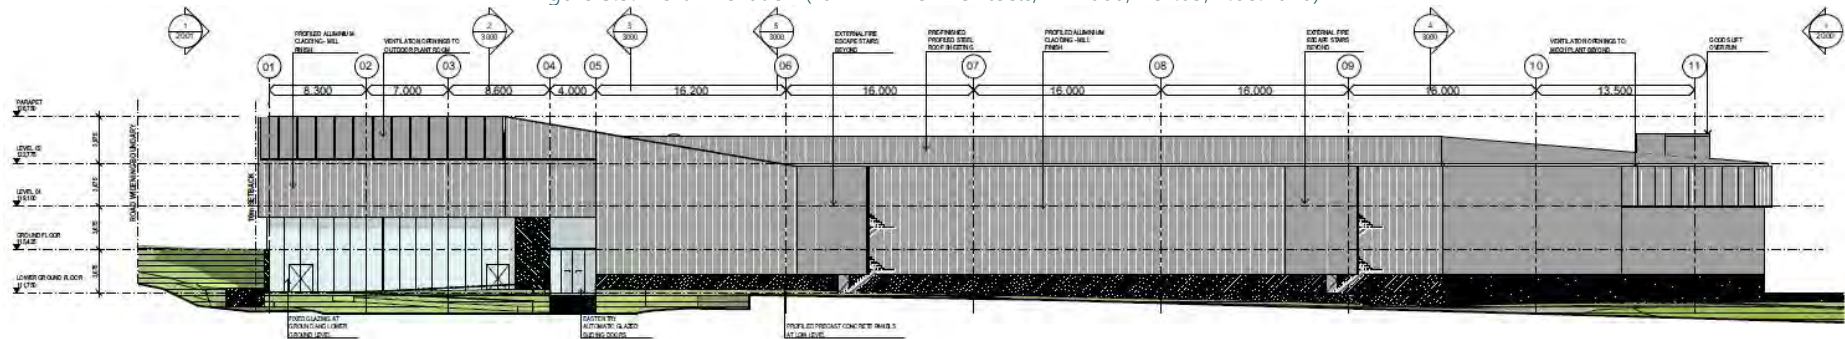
East Elevation (Lahznimmo Architects, DA2000, Rev.09, 7.08.2020)
